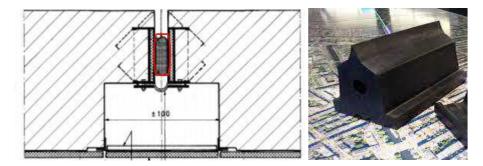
W9U profile in 3D view (left) and in cross-sectional view in structural slab (right)
